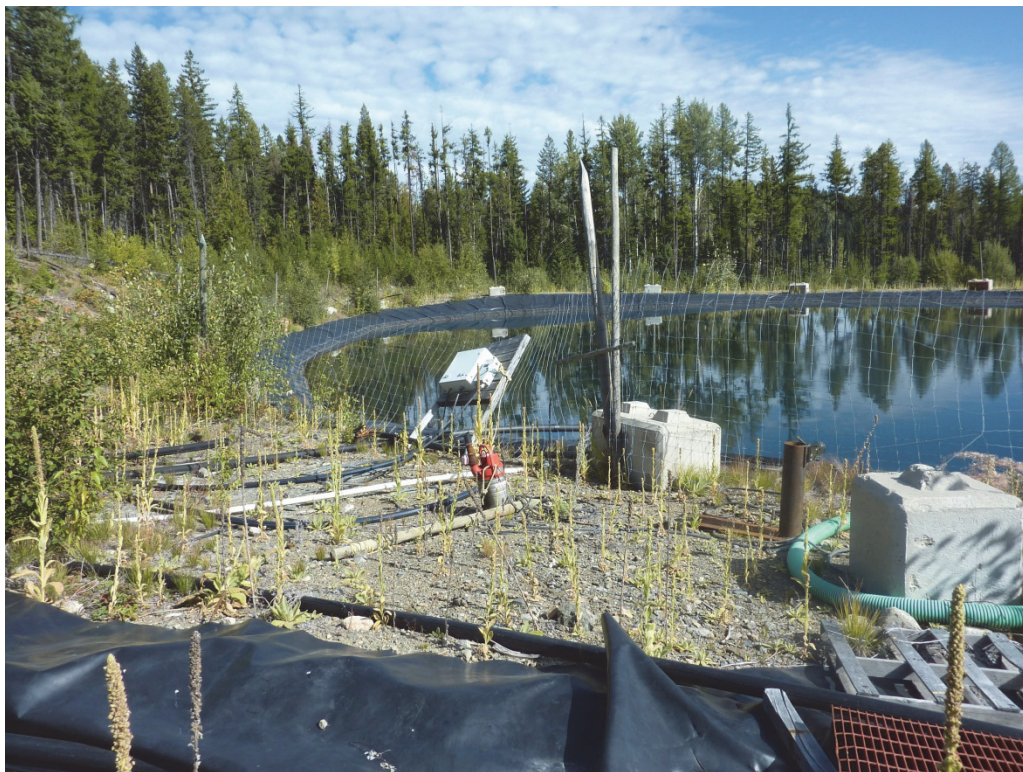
Emergency Water Pond – Power Panel Leaning Against Fence
